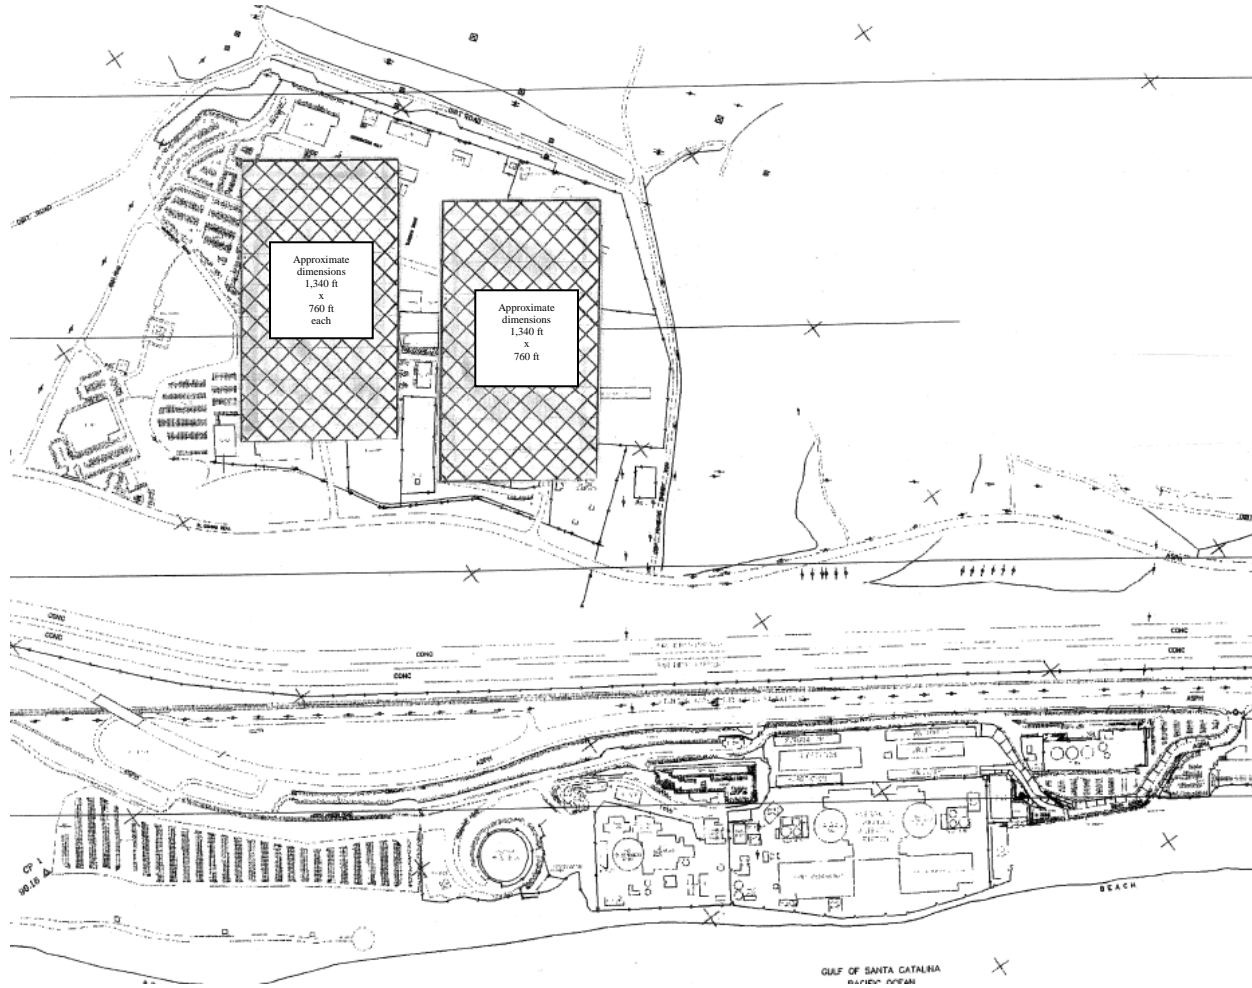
Conceptual Plot Plan Mechanical (Forced) Draft Dry Air Cooling Towers
